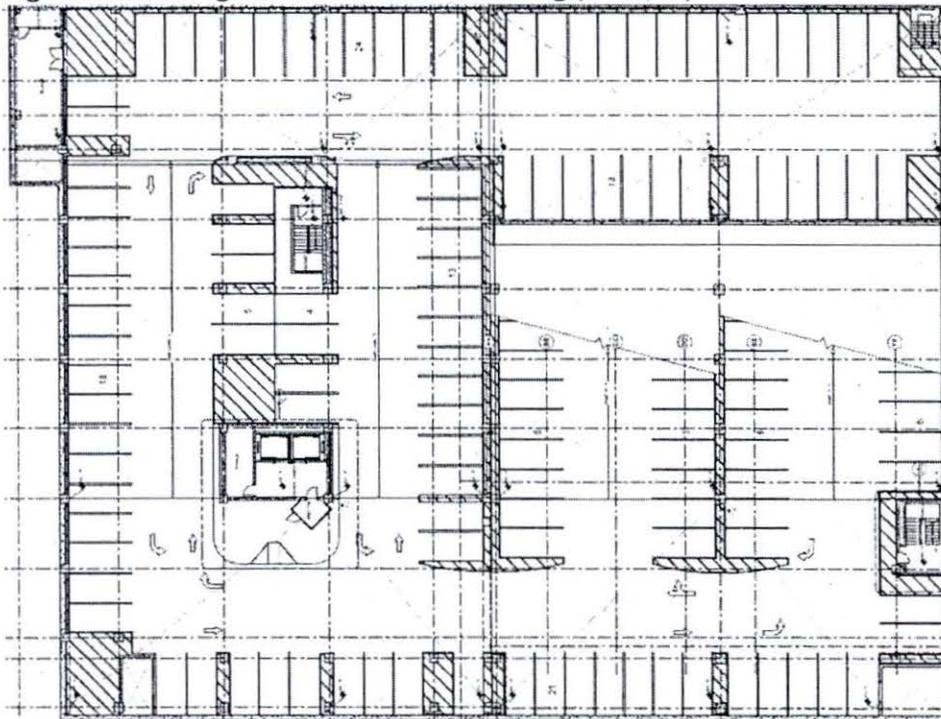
Parking Plans for MITRE 4 Building (P2/P3 Levels)
